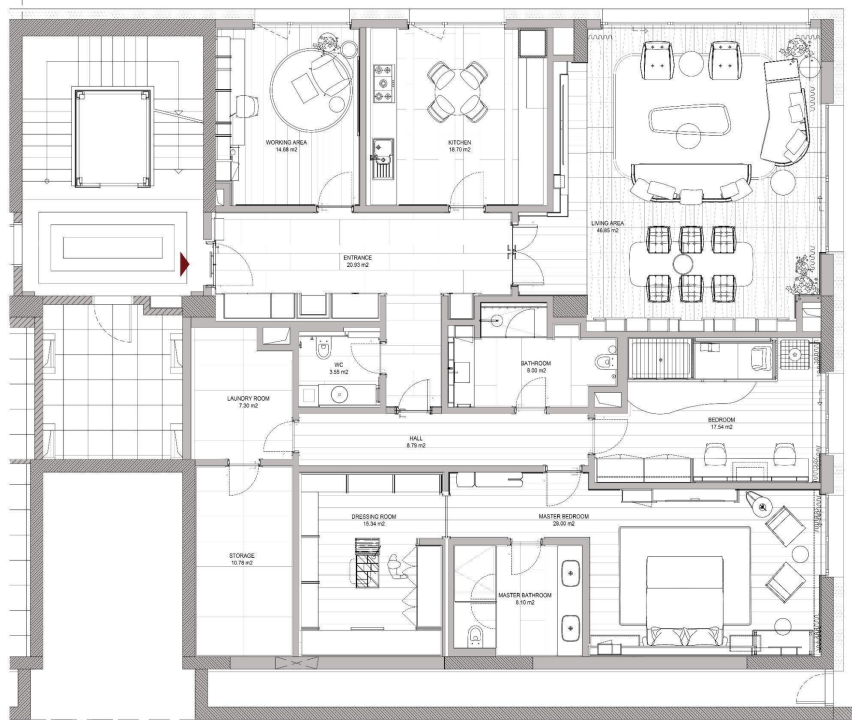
Mona94 Istanbul Project Plan (Gonye Design Archive)
